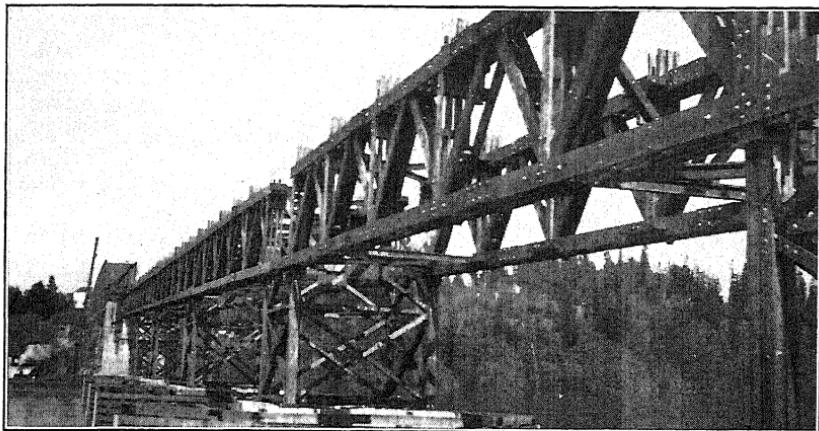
Puget Island-Cathlamet, Washington, Bridge over Columbia River. Bridge is 2400 ft. long and is built with Wolmanized Douglas fir and Teco connectors. Fabricated by Timber Structures, Inc., and built by Washington Dept. of Highways.
